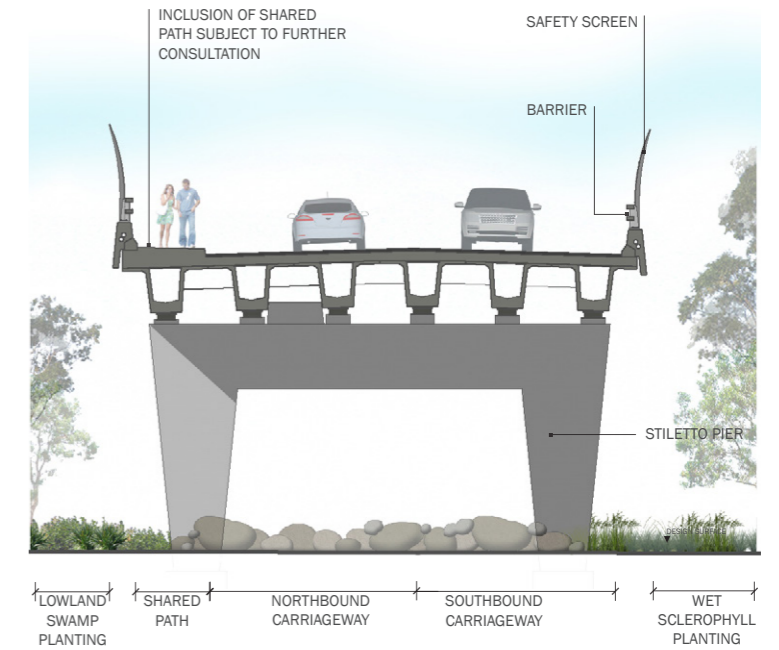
Typical cross section of overpass bridges (Scale 1:200)
